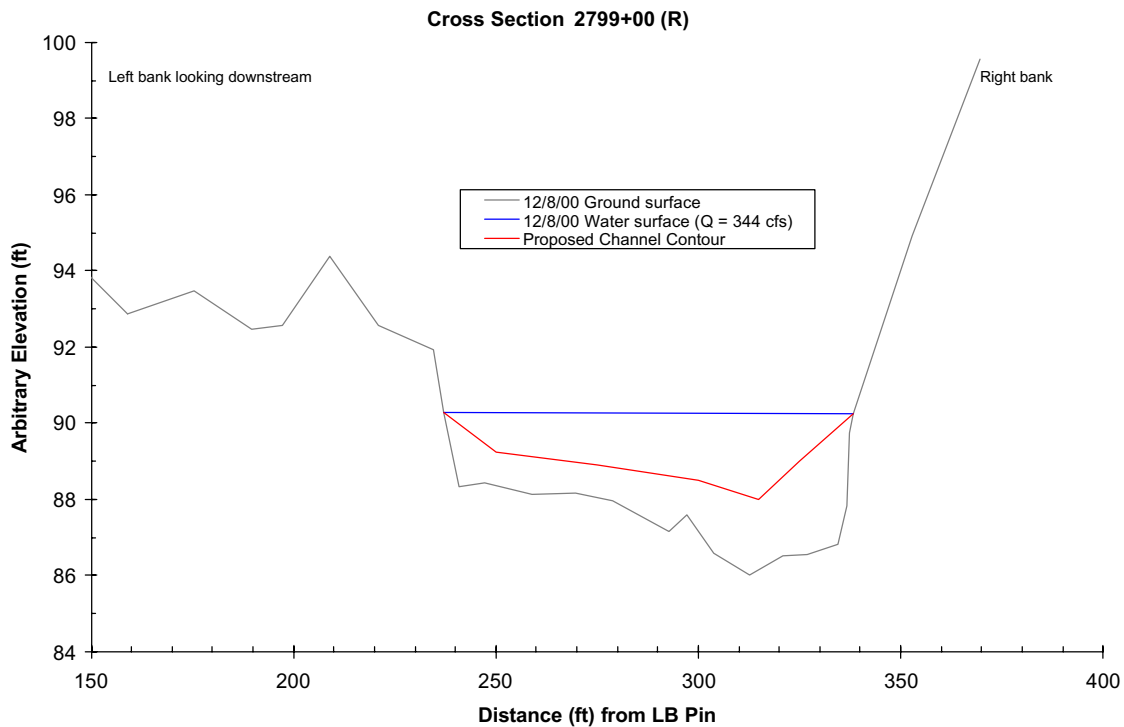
Cross Section 2799+00 traversing the downstream end of riffle A7. beyond this cross section the channel deepens to 6-8 ft.
